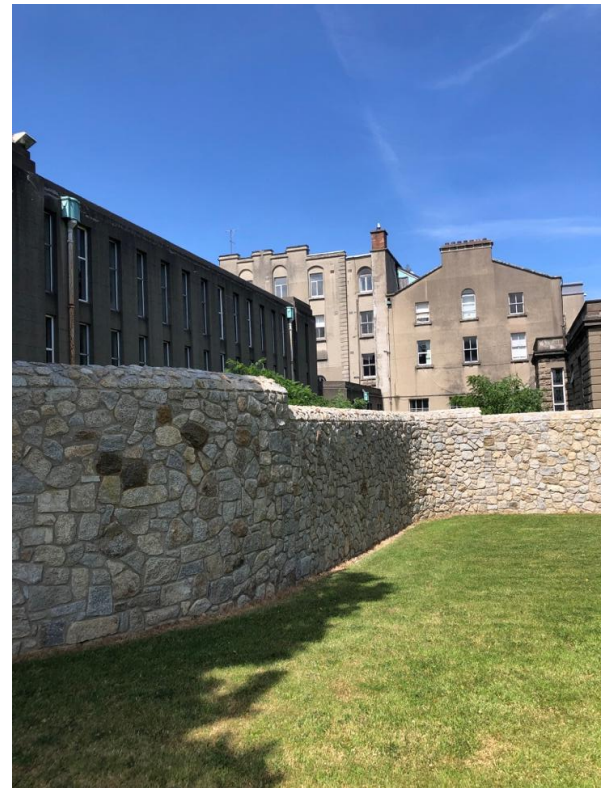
Southern elevation of Building A, with the Archive (Building F) to the left and the Finlay wing (Building E) to the right, with recently constructed boundary wall in foreground
